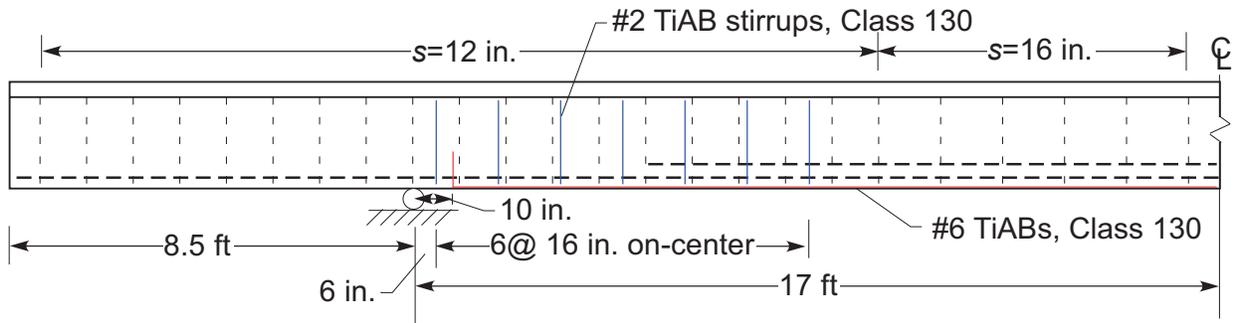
Elevation View of Strengthening Design with TiABs
